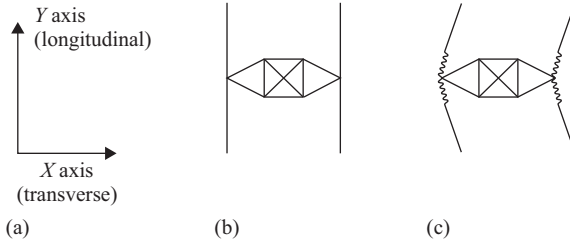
Transverse and longitudinal axis loads: (a) axis, (b) suspension tower plan view and (c) tension tower plan view
